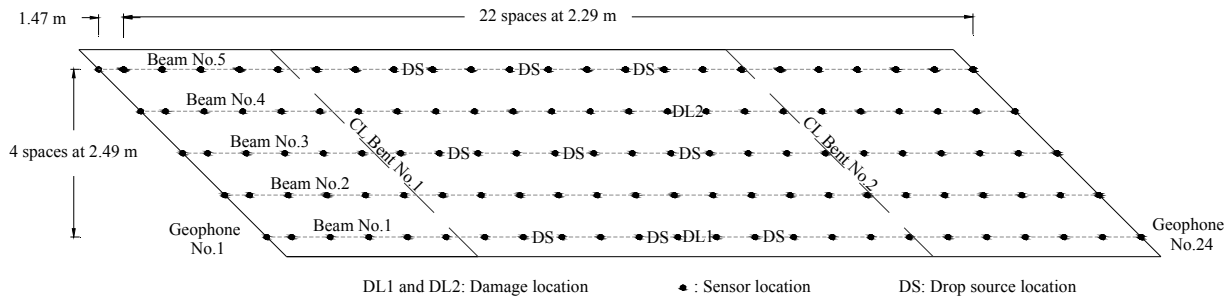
I-40 westbound bridge over 4th Avenue: sensor layout (modified from Ragland et al. 2011)
